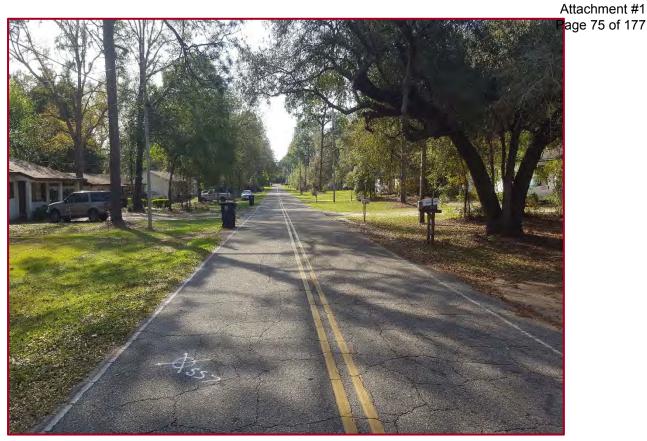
C: EXISTING SITE CONDITIONS ALONG BRIANDAV STREET NEAR SOIL BORING SS-7 (FACING NORTHWEST)
